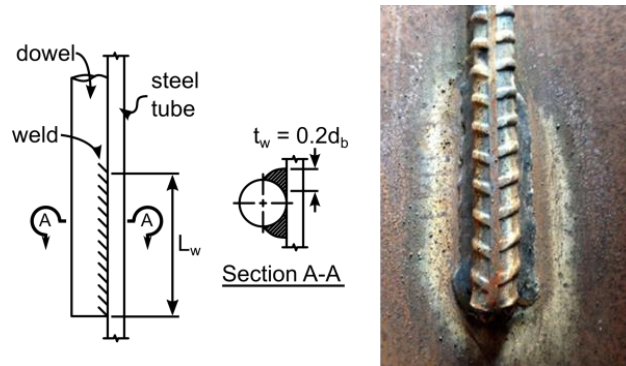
Flare Bevel Groove Weld Between Longitudinal Dowel and Steel Tube
